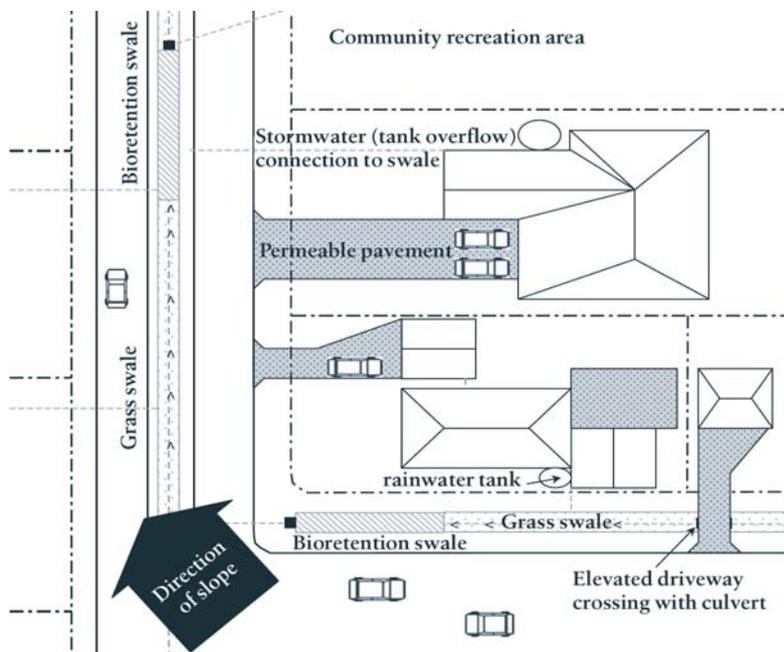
Diagram of Water Sensitive Residential Streetscape Showing Bioretention Swale Street Drainage
